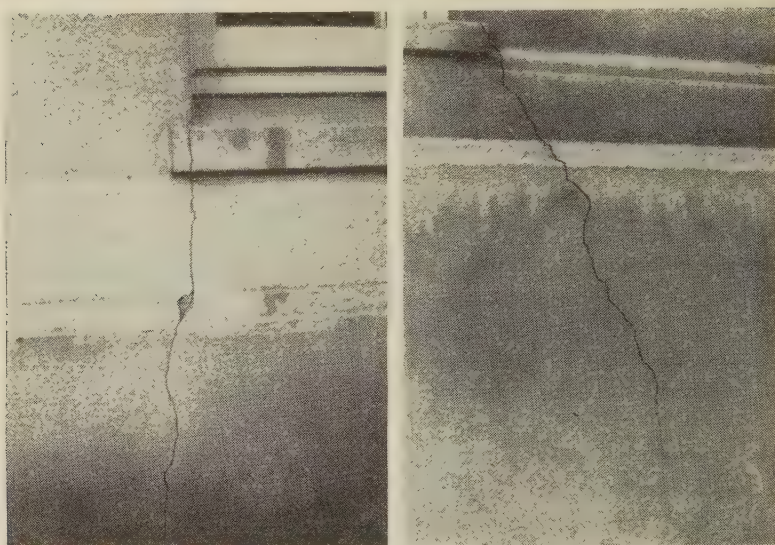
CONTRACTION CRACK AT WINDOW CORNER DUE TO REDUCED SECTION AND TO CONCENTRATION OF SHRINKAGE STRESSES
